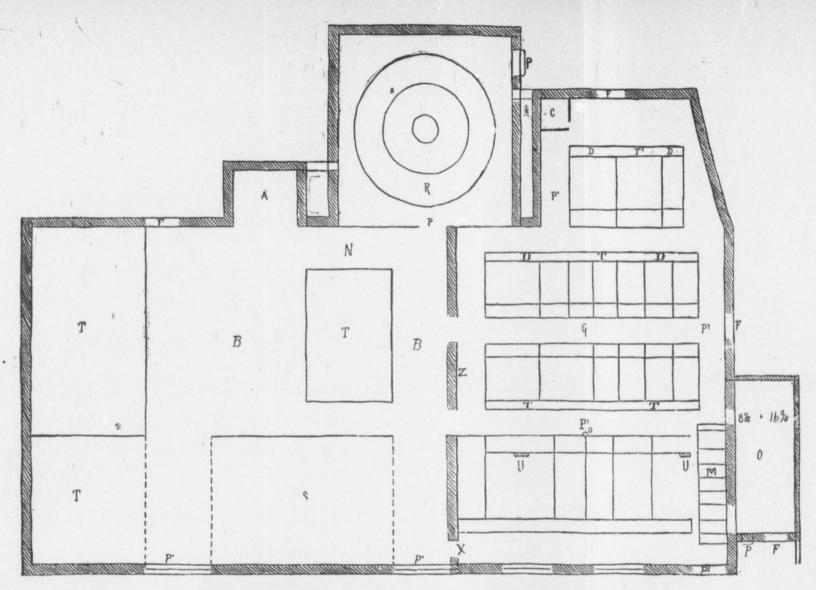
Plate VI.—Building of MM. Paquet, St. Nicolas, Q., (continued).—Ground plan.
